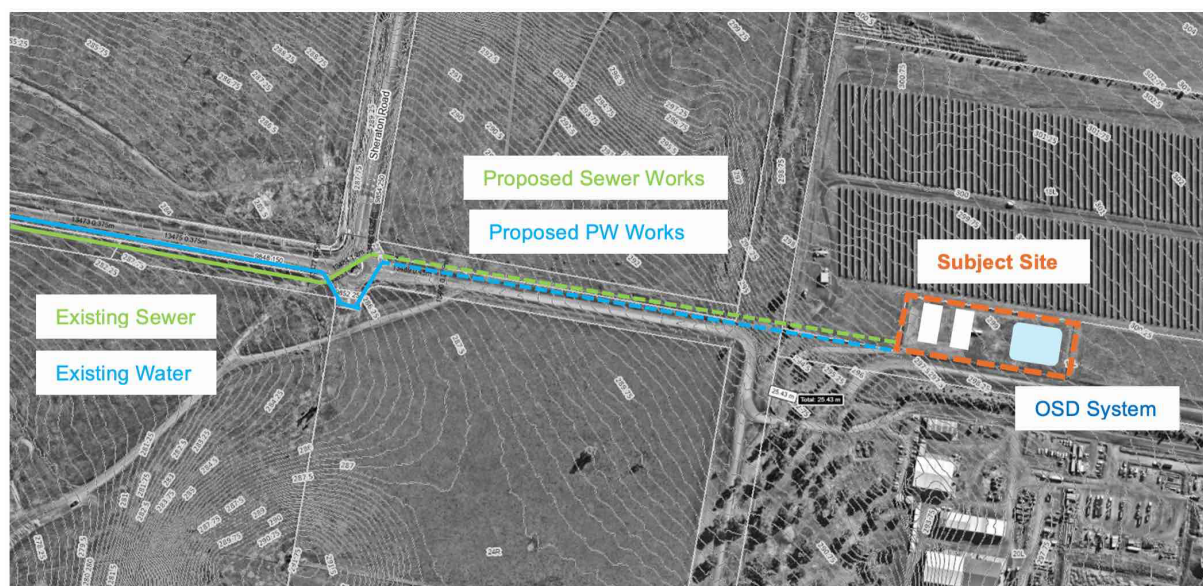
Proposed infrastructure servicing approach, with Works-in-Kind or Voluntary Planning
